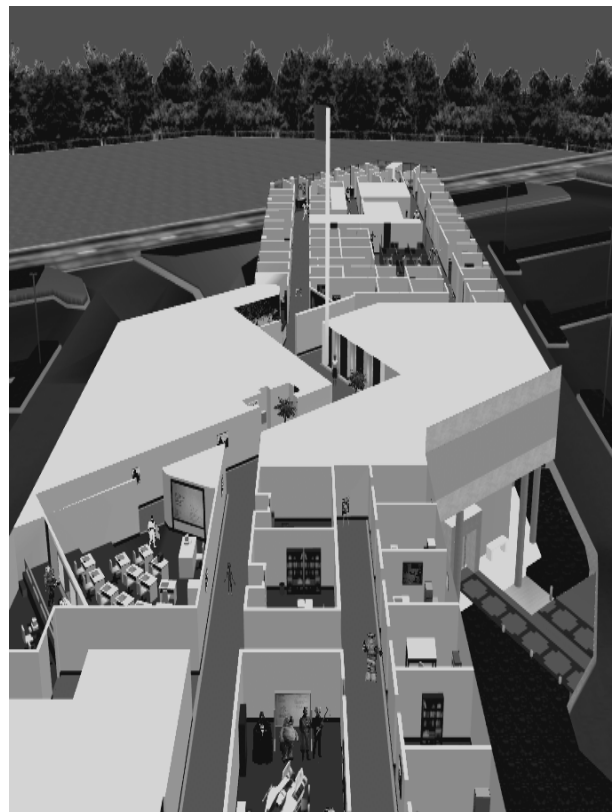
Aerial View of Third Floor Viewed at 98 feet
